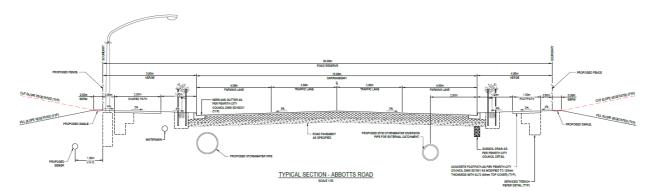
Typical Section of the proposed upgrade of Abbotts Road
